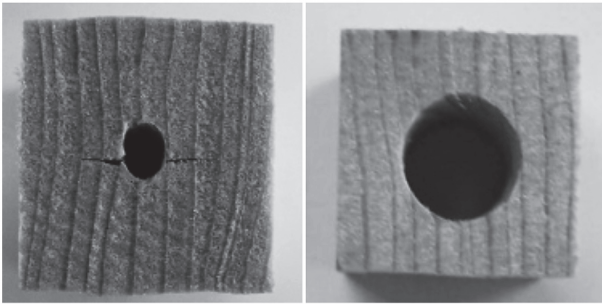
Cracked specimen (left: 4 mm–No. 5) and non-cracked specimen (right: 10 mm–No. 2) for load perpendicular to grain (pine).
